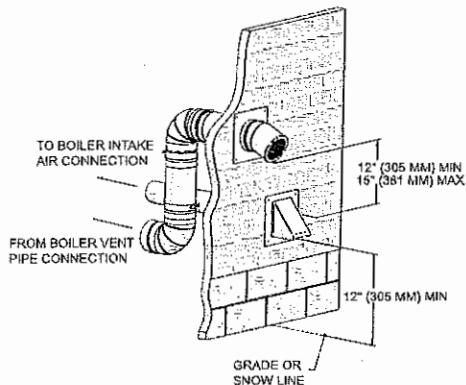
B Alternate Stainless Steel Sidewall Termination Models 701 - 801 w/Field Supplied Fittings
